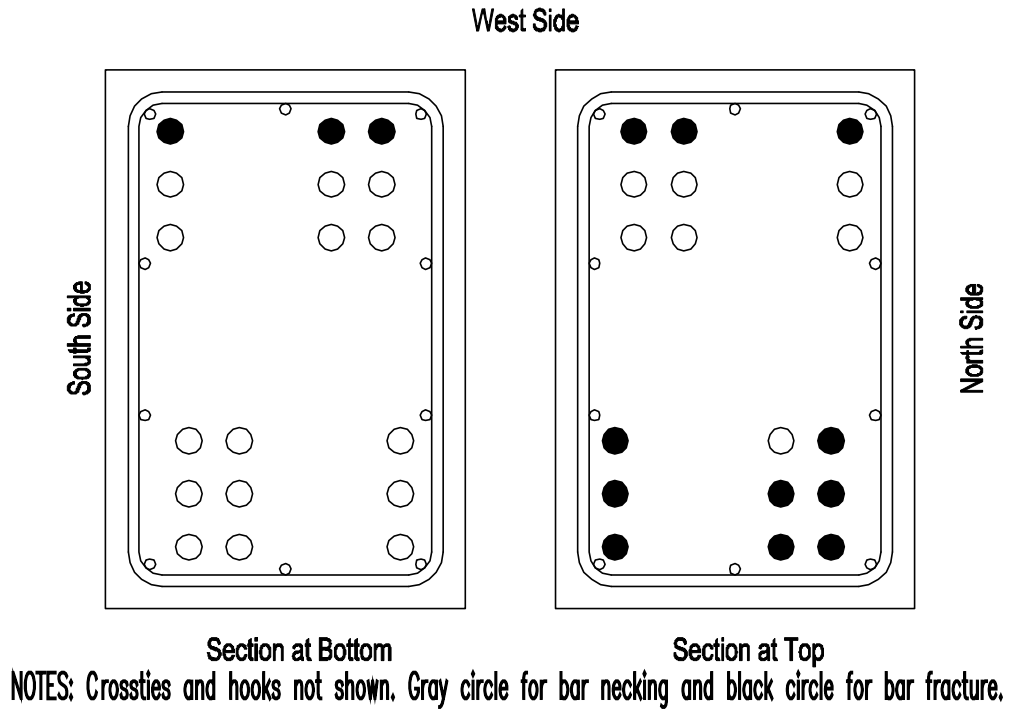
Reinforcing bar fracture locations, D80-3.5
